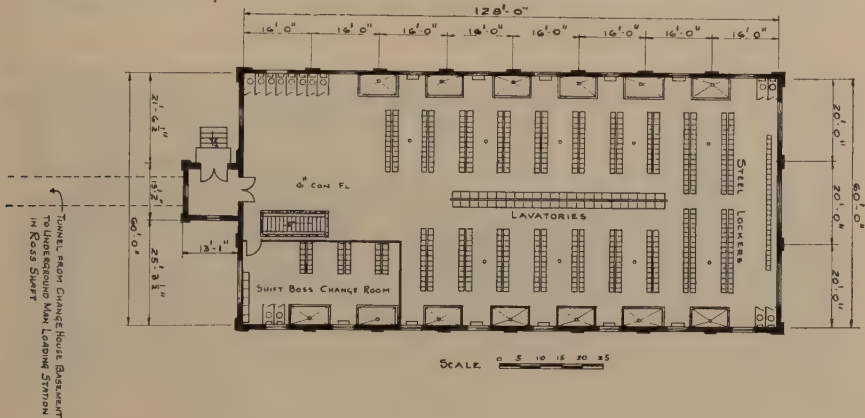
FLOOR PLAN OF CHANGE HOUSE.
